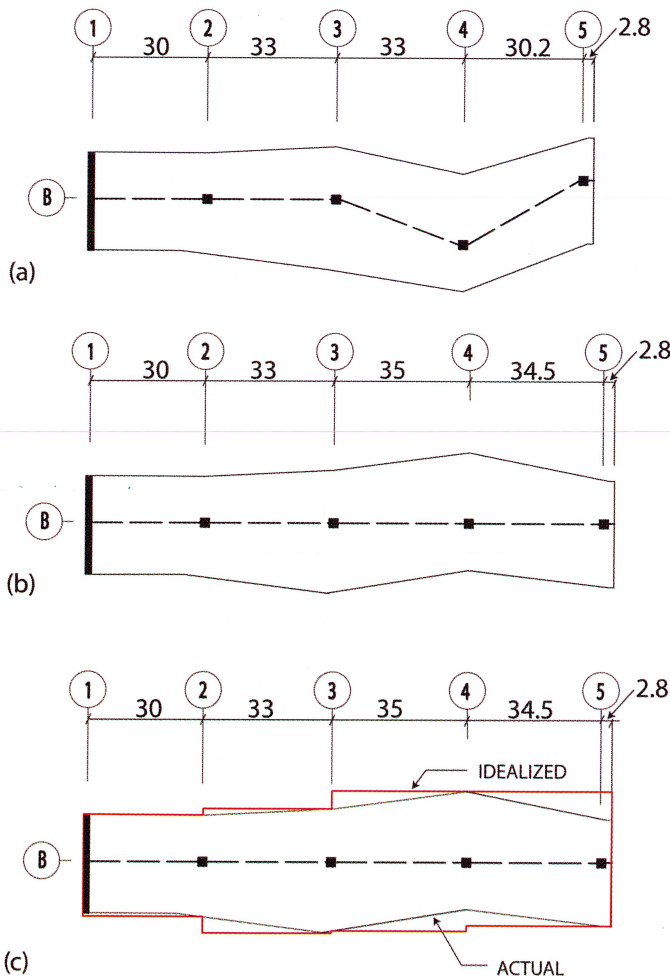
Plan views of design strip at Column Row B: (a) actual design strip; (b) straightened design strip; and (c) idealized design strip (after Reference 2). All dimensions in ft
